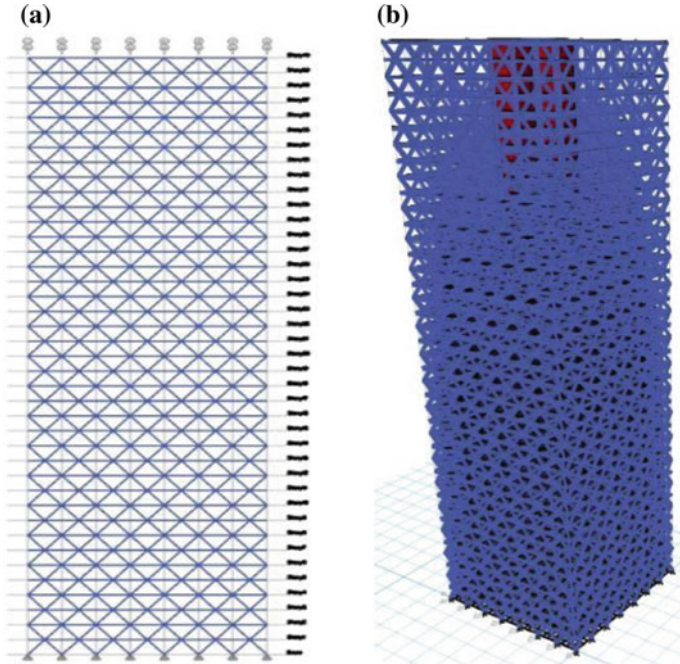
a 2D elevation view of diagrid structure b 3D elevation view of diagrid structure
